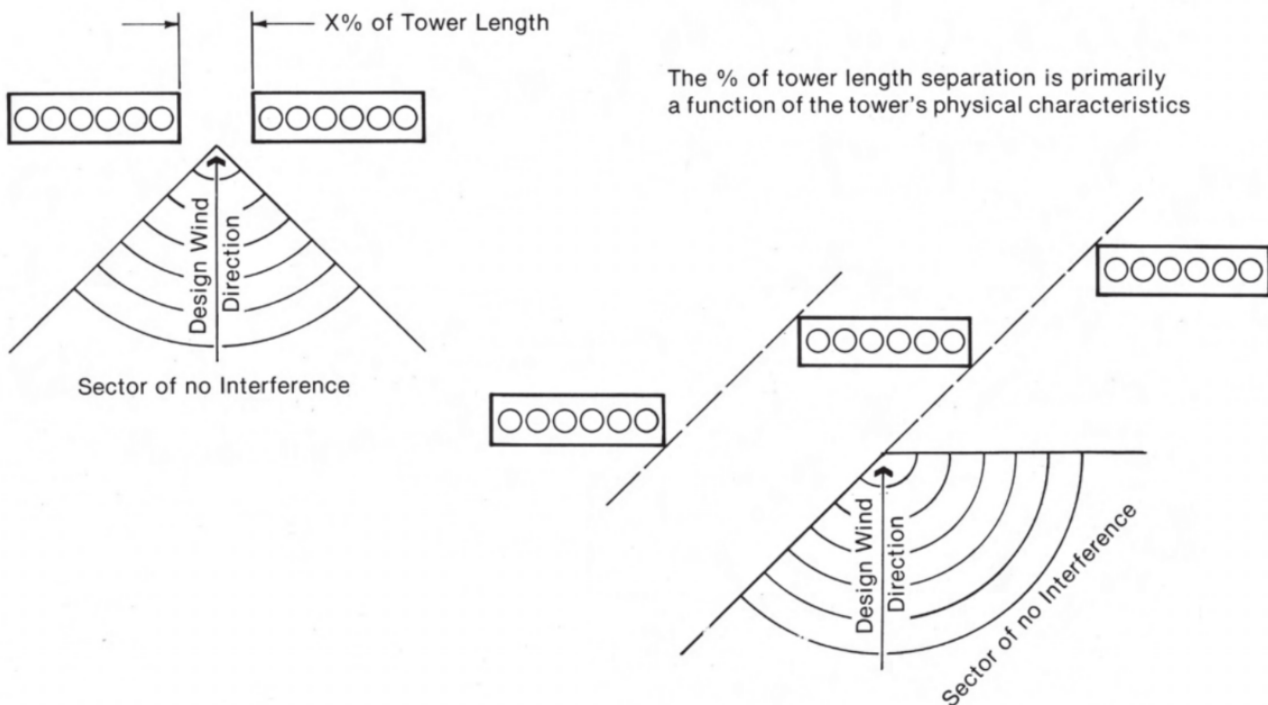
Recommended orientation of towers in a prevailing broadside wind
